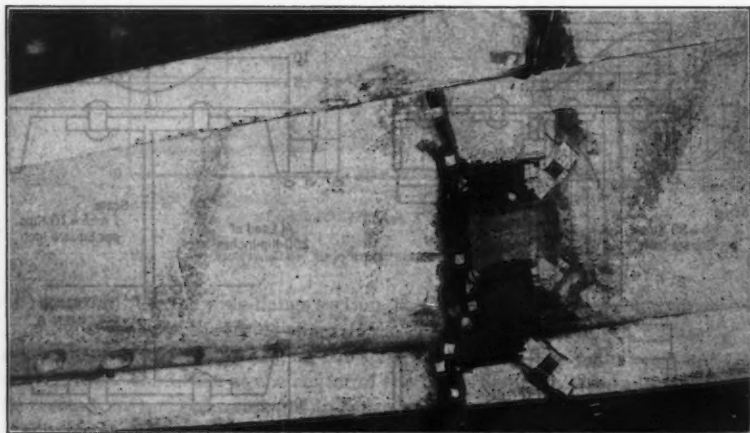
COLUMN SPECIMEN B AFTER TESTING
